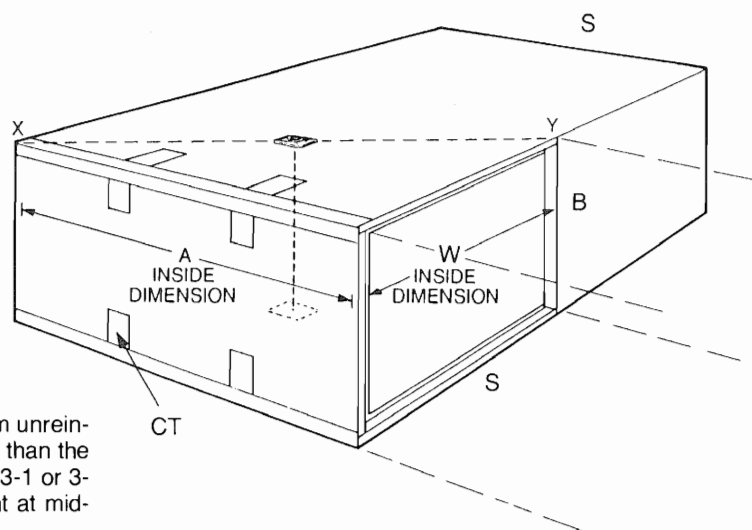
TYPICAL CHANNEL REINFORCEMENT ON 16" CENTERS, 48" DUCT SECTIONS
